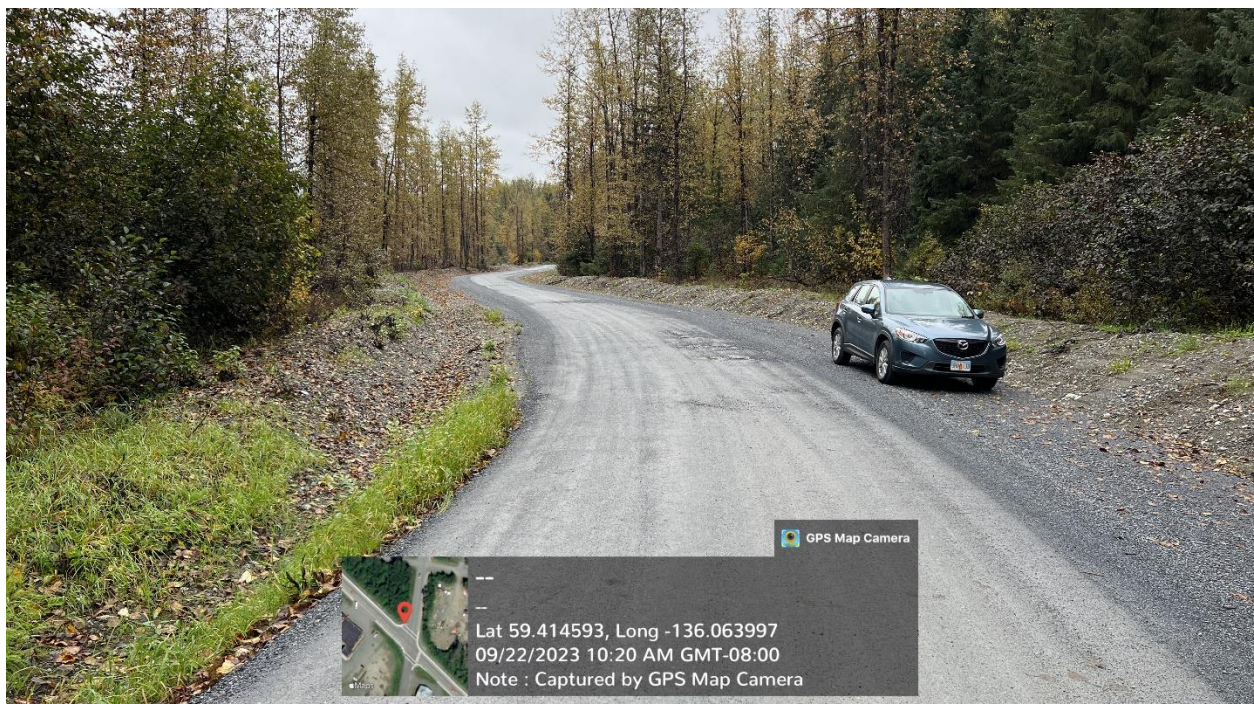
Phase 1 gravel surfacing and end of ditch reconditioning work prior to Herman Creek, photo facing towards beginning of road.
